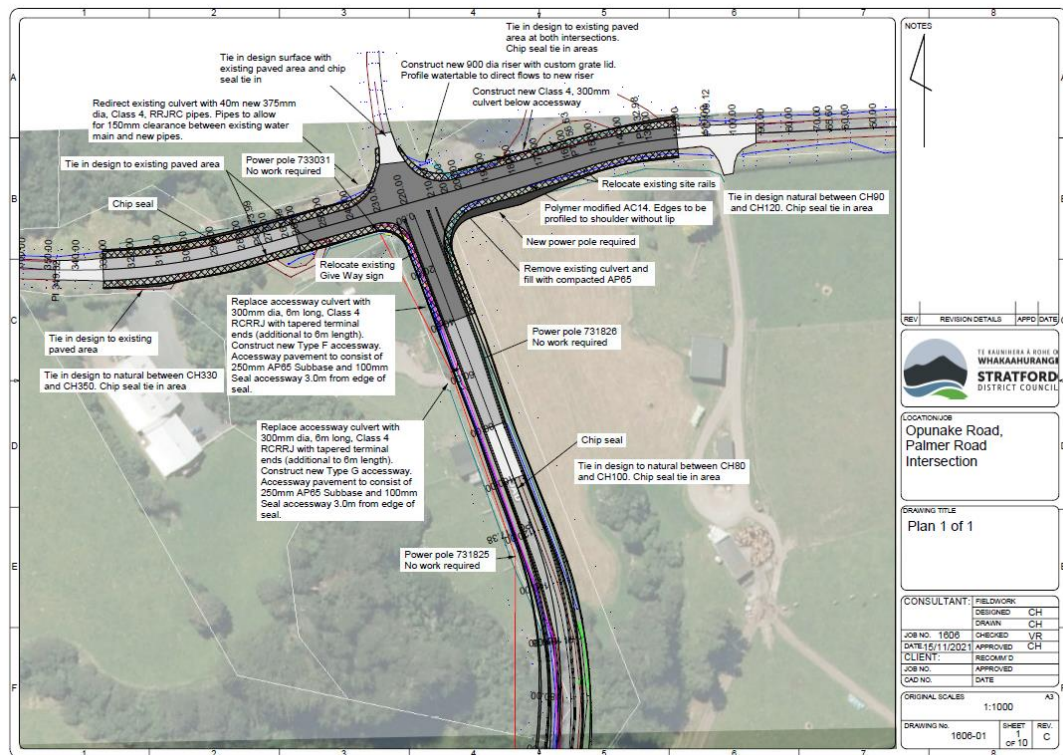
Scheme plan of the Opunake Road/Palmer Road Intersection.
